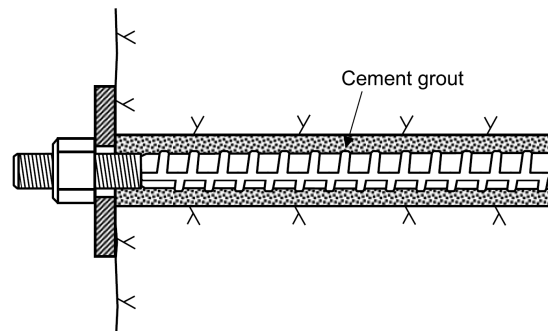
Schematic layout of an installed grouted rebar bolt (from: Li (2007))
